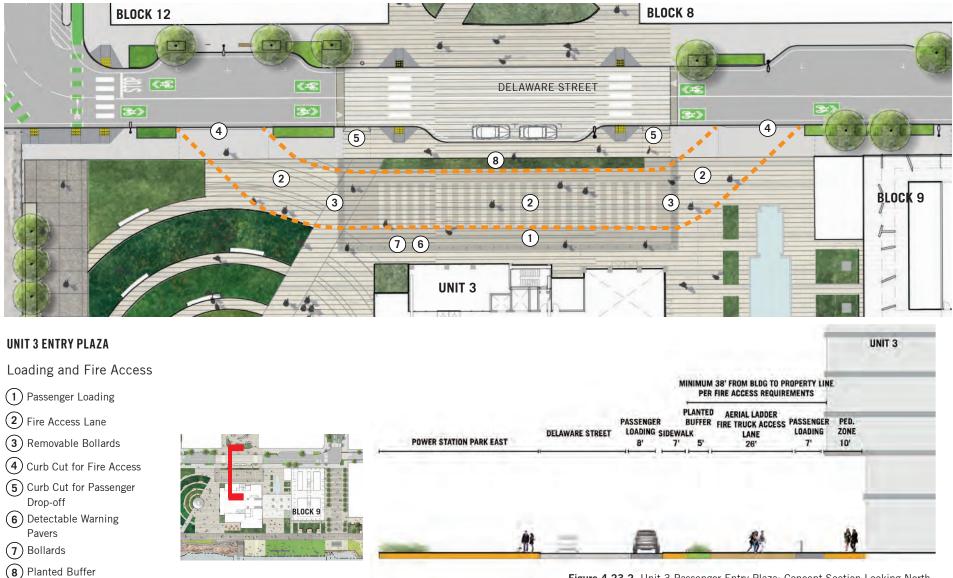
Unit 3 Passenger Entry Plaza: Concept Section Looking North
